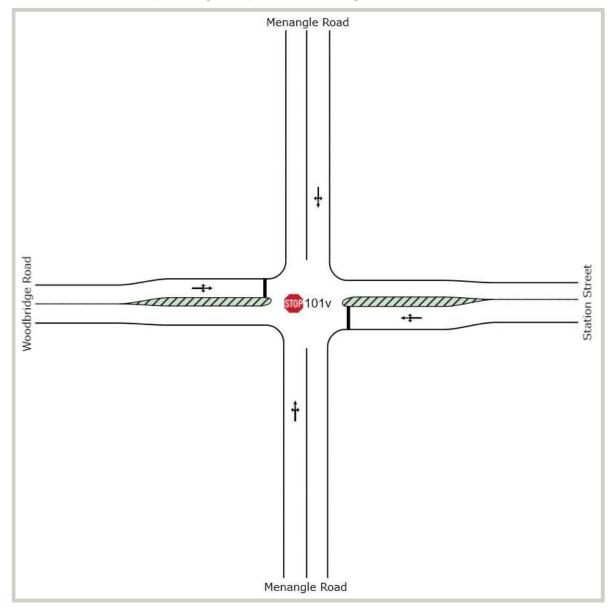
Adopted SIDRA Existing Menangle Road / Station Street Intersection Layout
